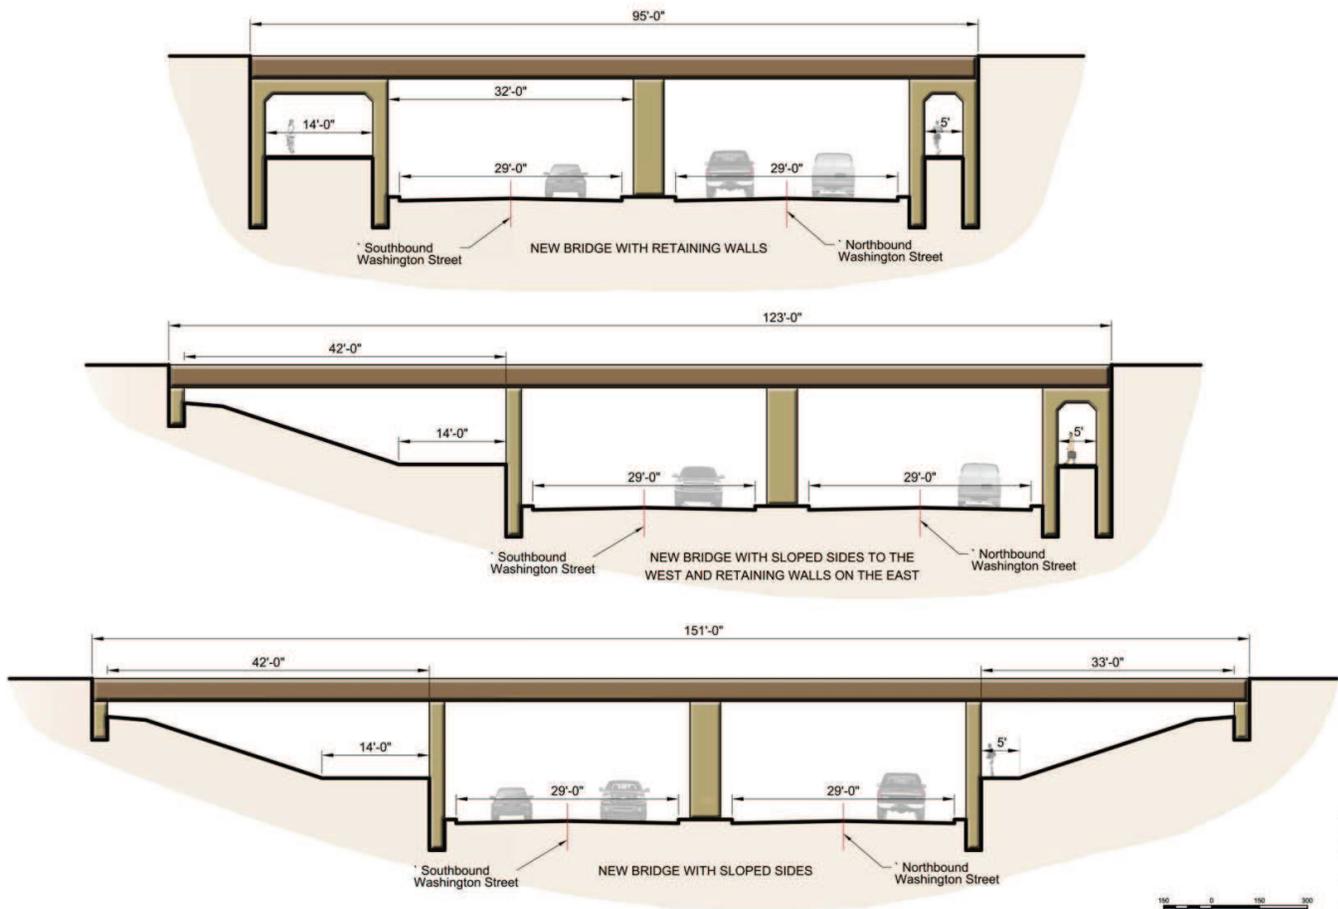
Bridge Alternatives - Cross Sections
